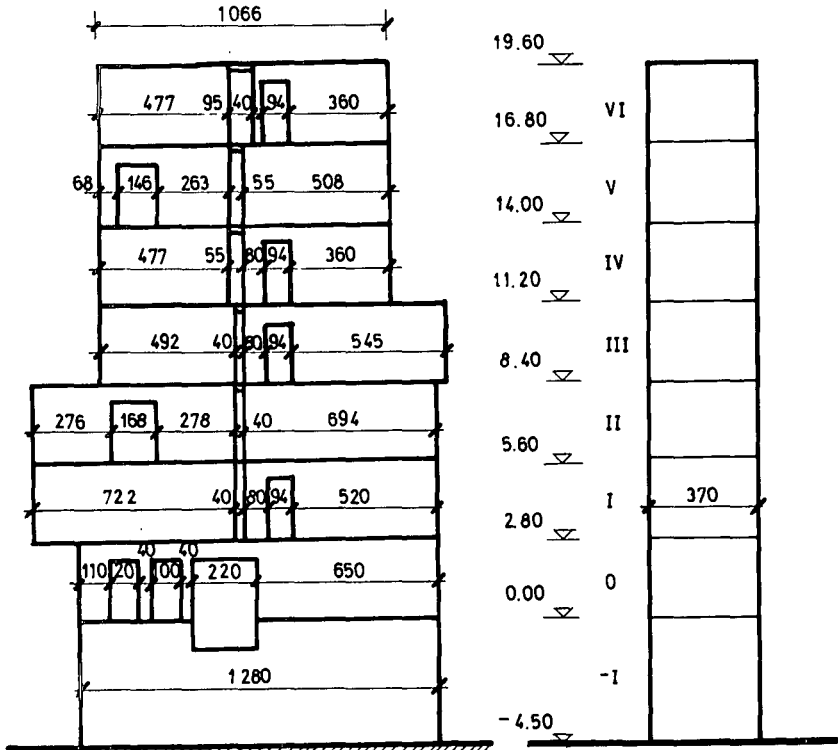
VERTICAL SECTION OF SHEAR WALLS
